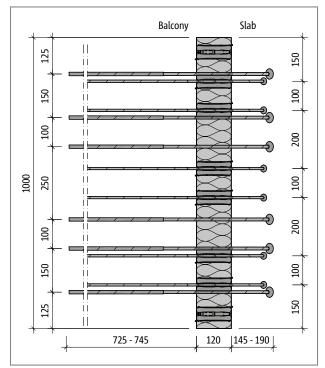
Schöck Isokorb® XT type K-O-M2: Product plan view
